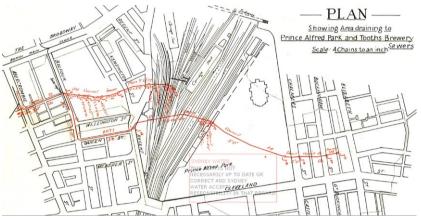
C.1950 sewerage plan indicating the full extent of the drain as well as annotations regarding the dimensions of the drain. Source: Plan showing area draining to Prince Alfred Park and Tooths Brewery sewers, undated, Sydney Water Plans D29006.
